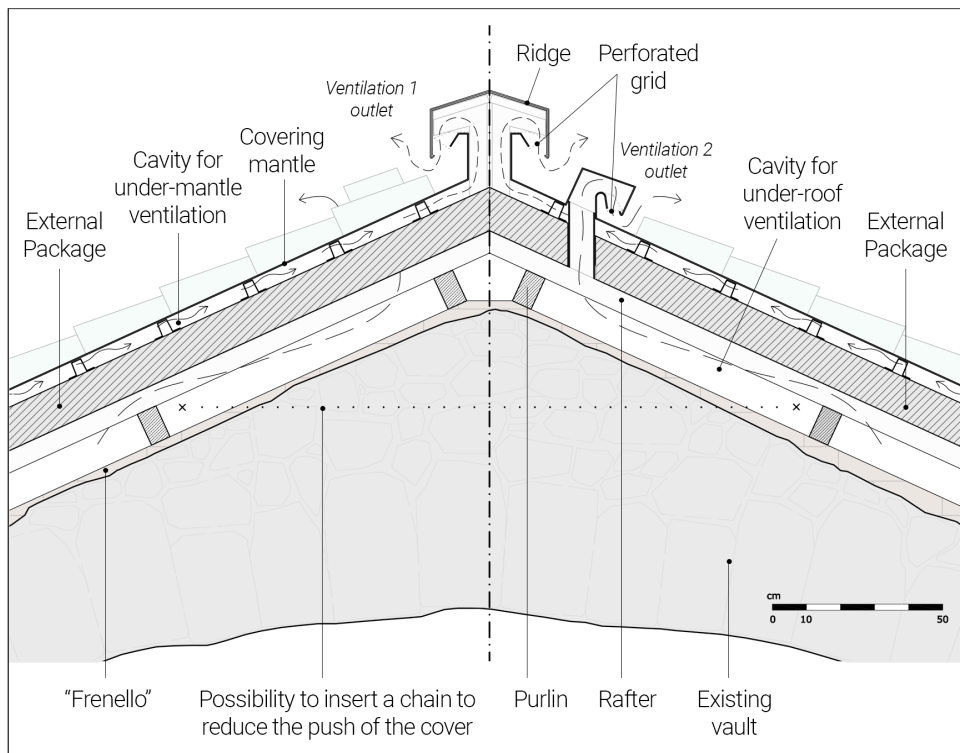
Detail of the air outlet node at the ridge for ventilation system 1 (right) and for ventilation system 2 (left).
